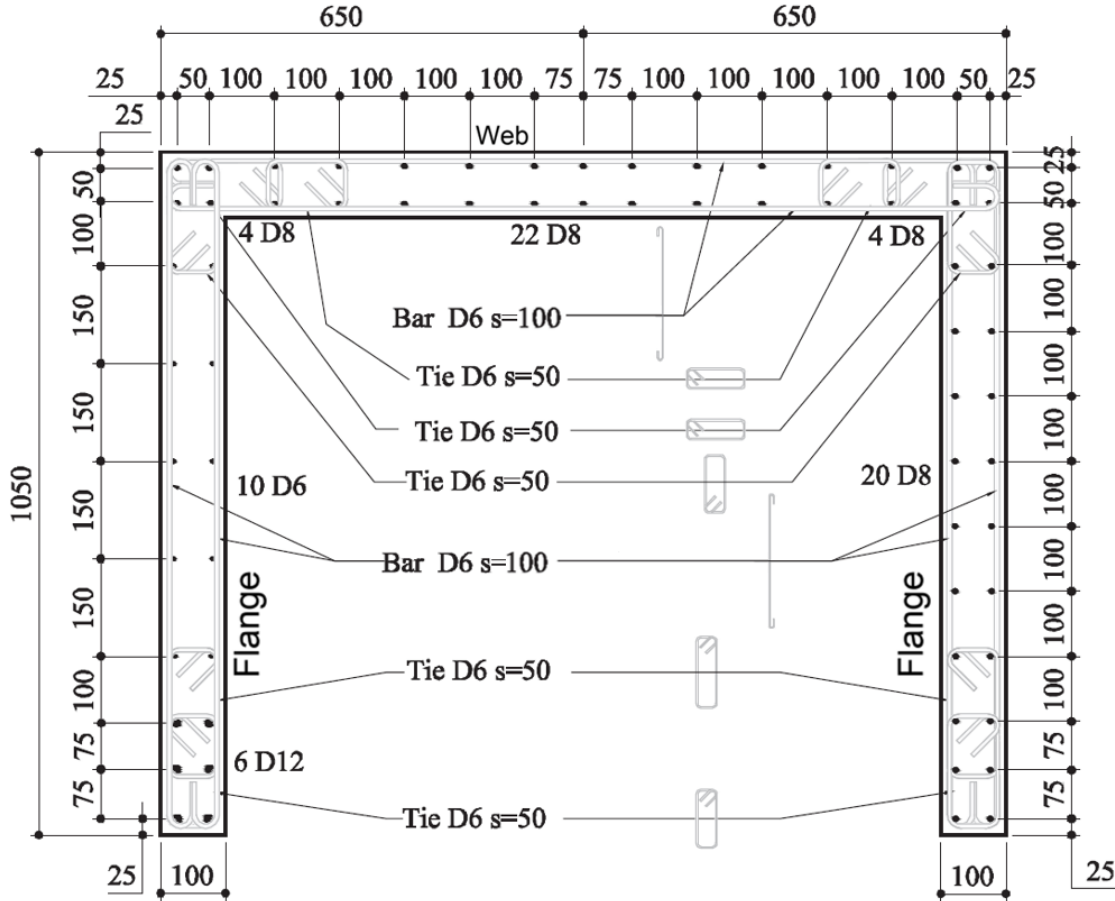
TUD: Cross section and reinforcement detailing from [6] [Unit: mm].
